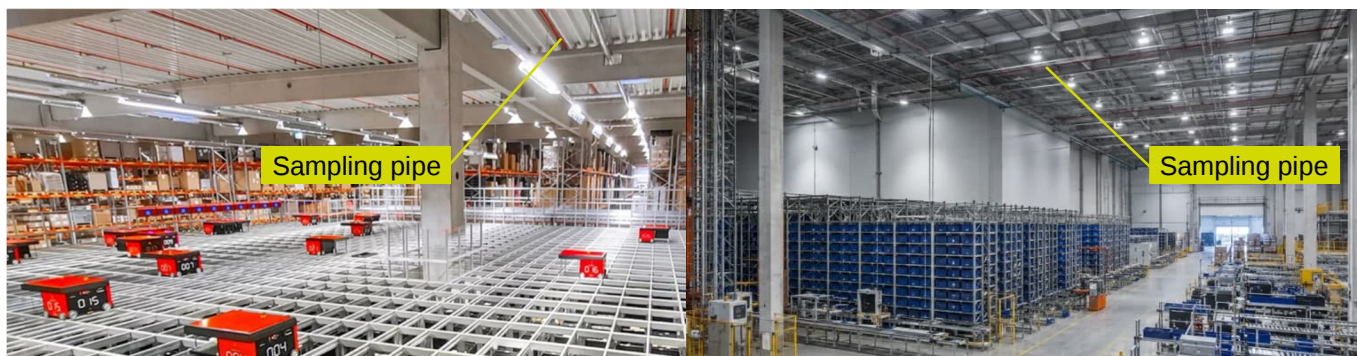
illustrates how SecuriSmoke ASD sampling pipes and sampling holes are located underside a flat ceiling. These layouts are relevant to ceilings which are not interrupted by significant joists, beams or other structural elements. For such structures, refer to Figure 7 in Chapter 3.3.2.
